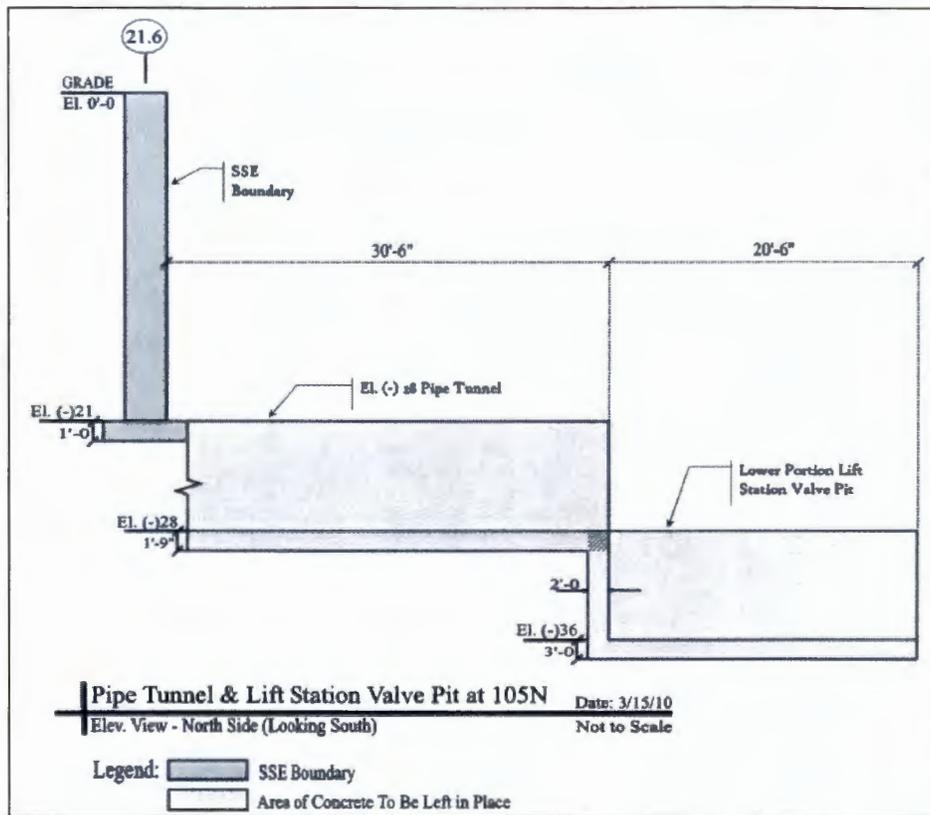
Plan for Pipe Tunnel and Valve Pit (North Wall) Facing South.
